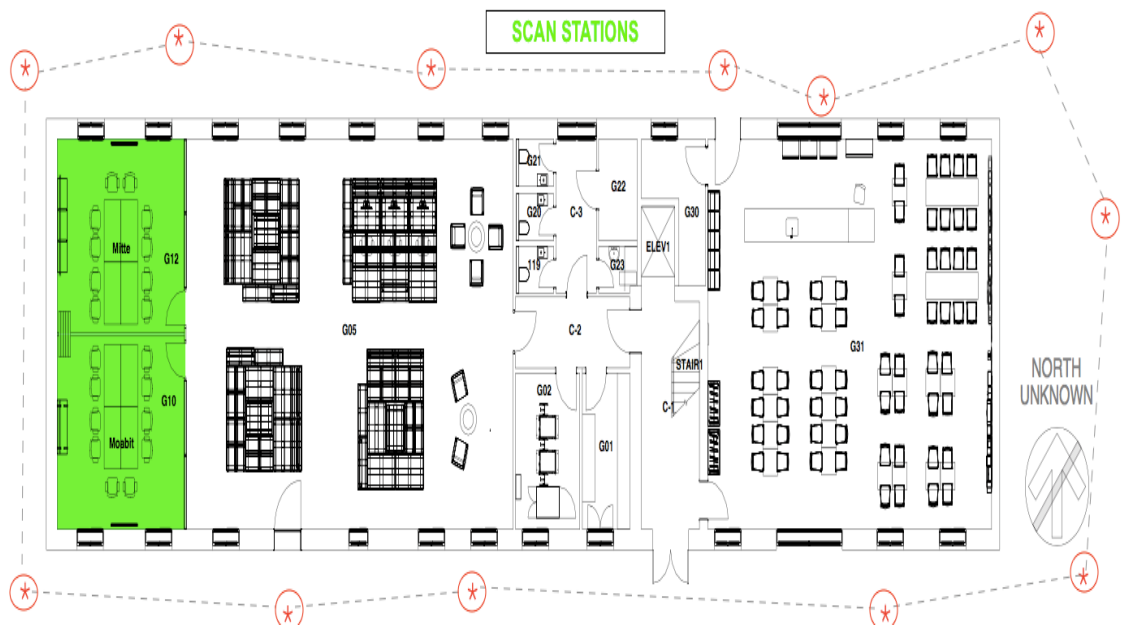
Scan plan for external face of site Torgauer strasse 12-15
